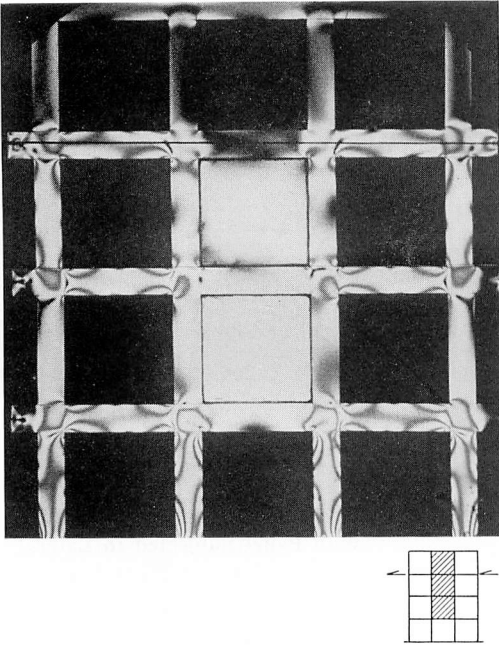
b Isochromatics of Frame with three Wall Panels Subjected to Lateral Forces on fourth Floor Beams
